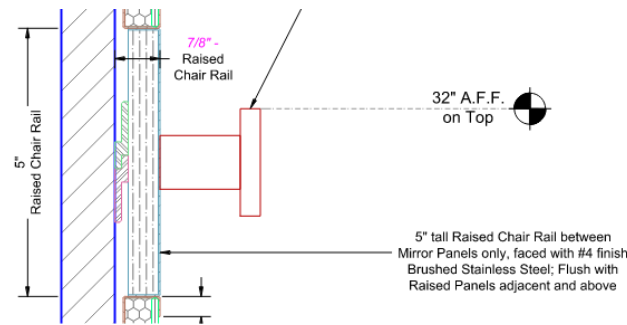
Incorrect shop-drawing section detail of chair-rail/handrail alignment (illustrative and de-identified).
